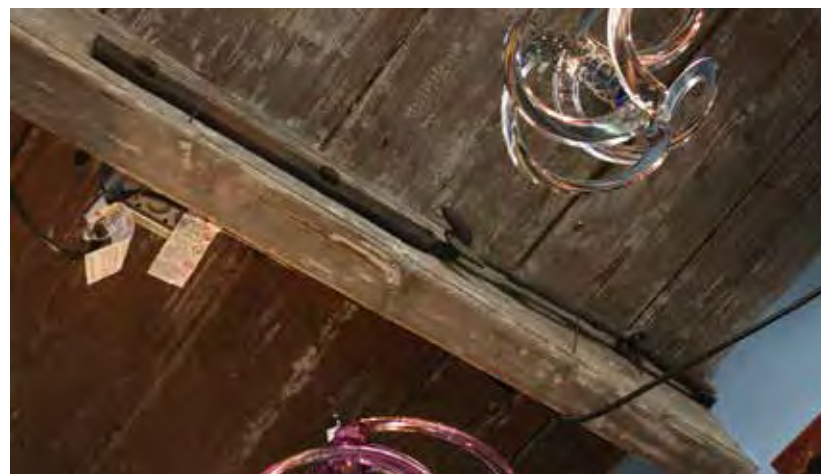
Tie rod holding the joist and steel plate inside the wall. Photo by Sujin Kim, 2017.
